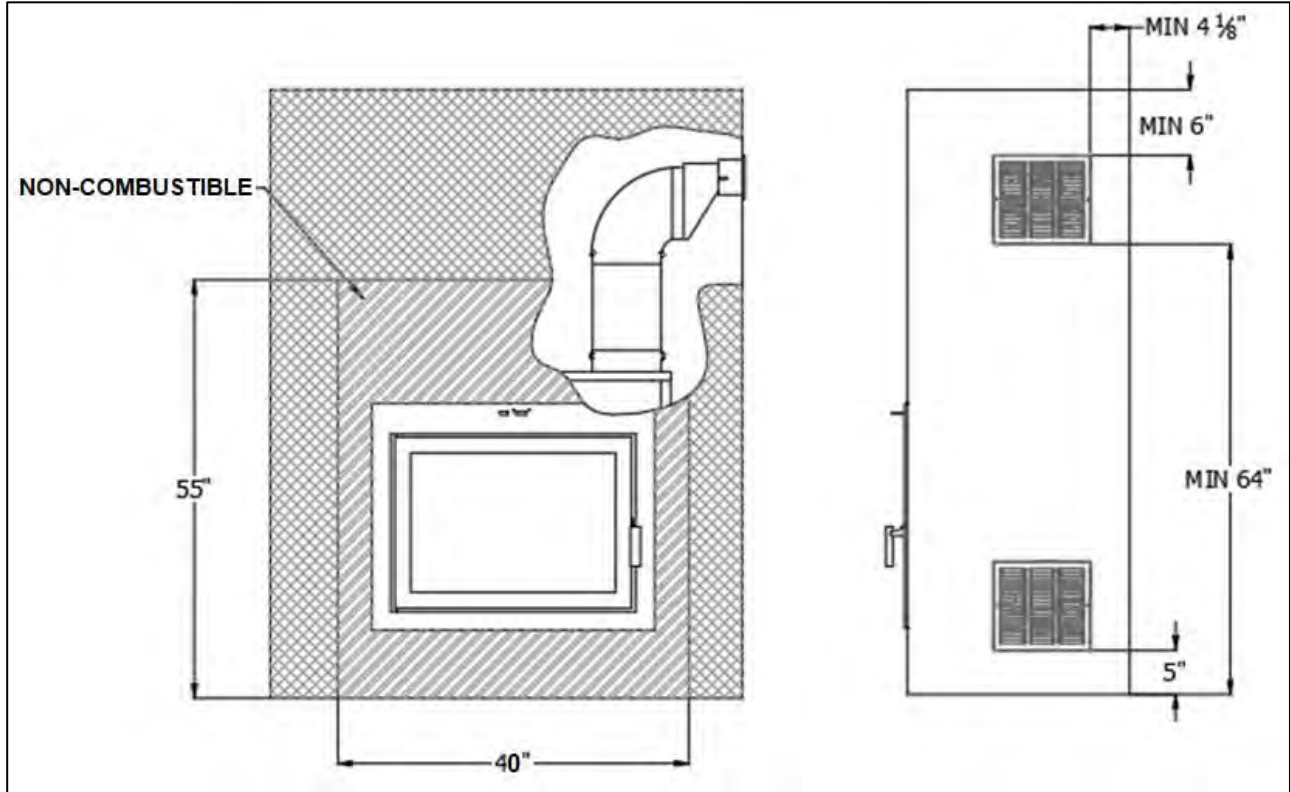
Front and Side Chase for Clean Face Dual Louver Configuration
